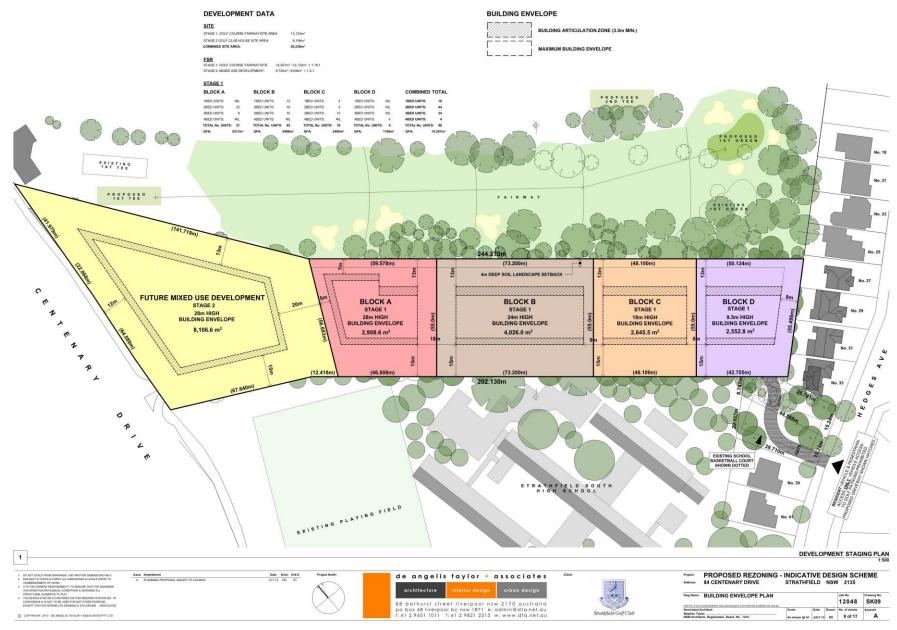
Indicative Building Layout, showing secondary site access from Hedges Avenue
